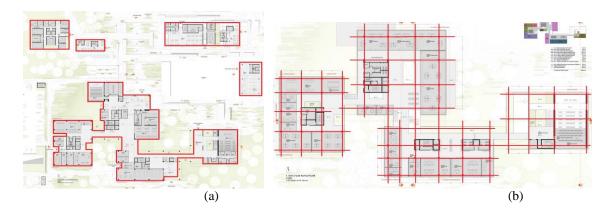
(a) Ground floor plan, (b) First floor axle plan
